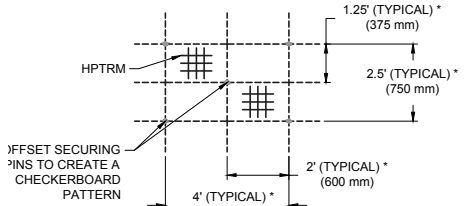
PIN PATTERN DETAIL SPECIFIC TO B1 ANCHOR RATIO OF 0.5 ANCHORS/SYD<sup>2</sup> (FOR EARTH PERCUSSION ANCHOR RATIOS OTHER THAN THE ABOVE, PLEASE CONSULT WITH PROPEX ENGINEERING SERVICES AT 423-553-2450)
